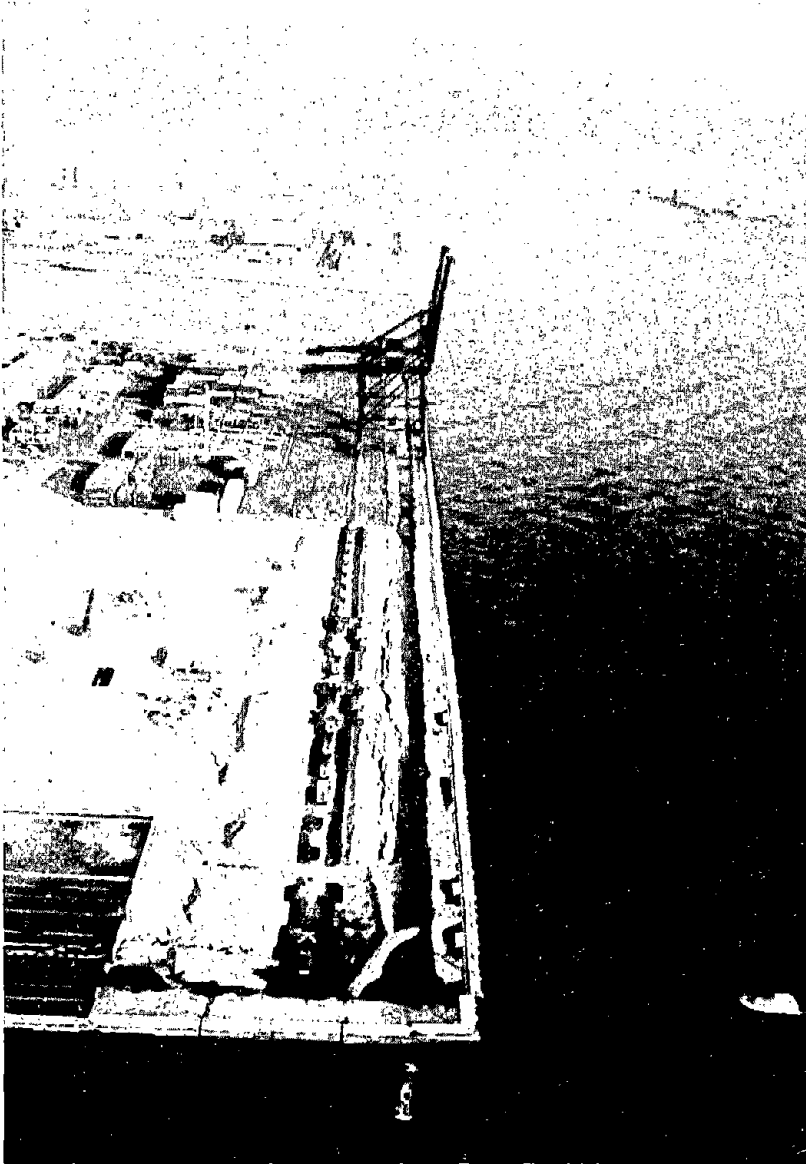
Air view of damaged quay walls and port facilities on Rokko Island. Quay walls have been pushed outward by 2 m to 3 m with depressed areas called grabens 3 m to 4 m deep forming behind the walls.
